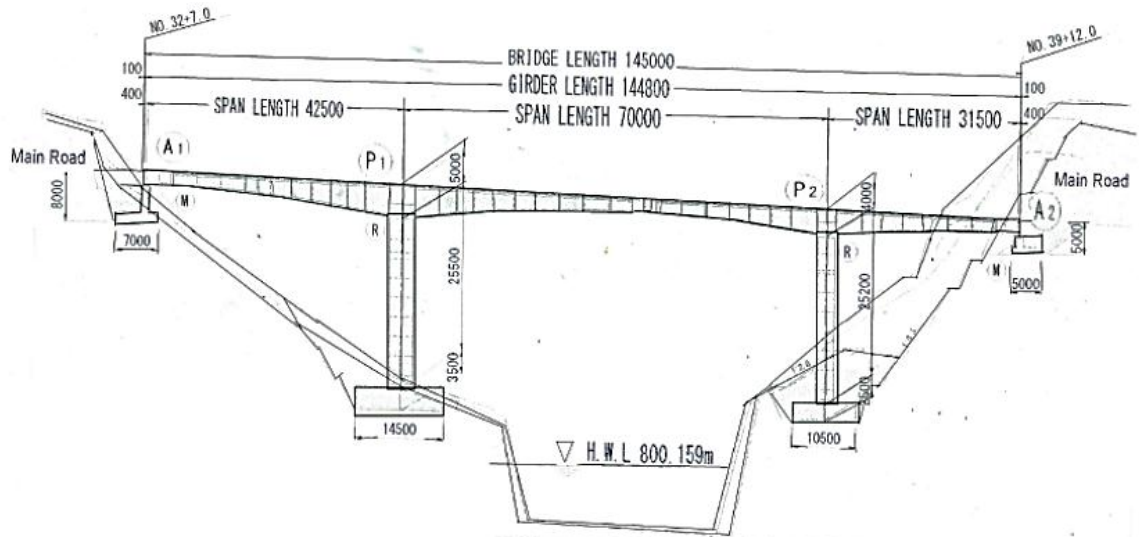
Longitudinal section of alternative Awash River Bridge (2014)
